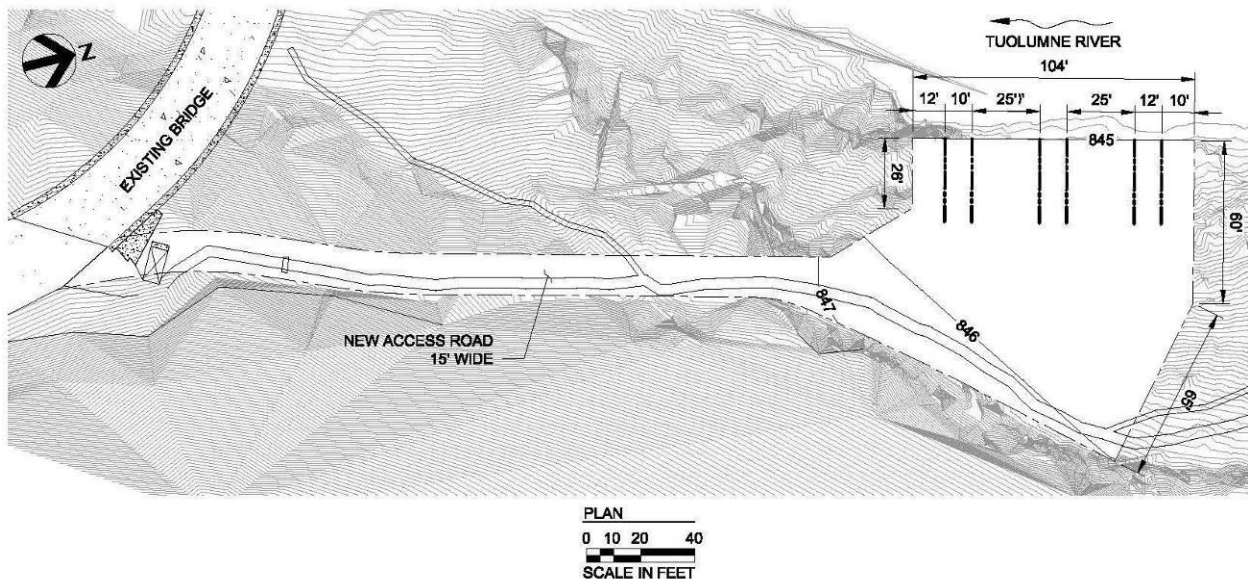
New access road for proposed Ward's Ferry whitewater boating take-out facility.
